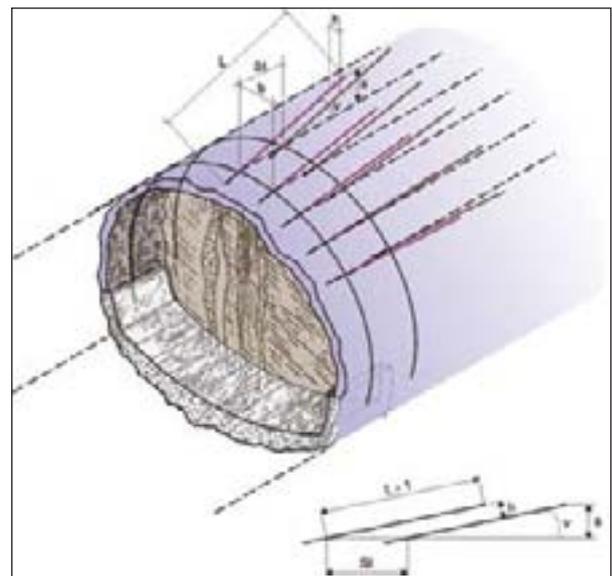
Example of installing of spilingat face for a typical road tunnel profile.
